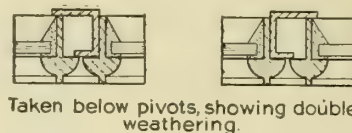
DETAIL SHOWING INSTALLATION OF SASH WITH STEEL FRAMING
